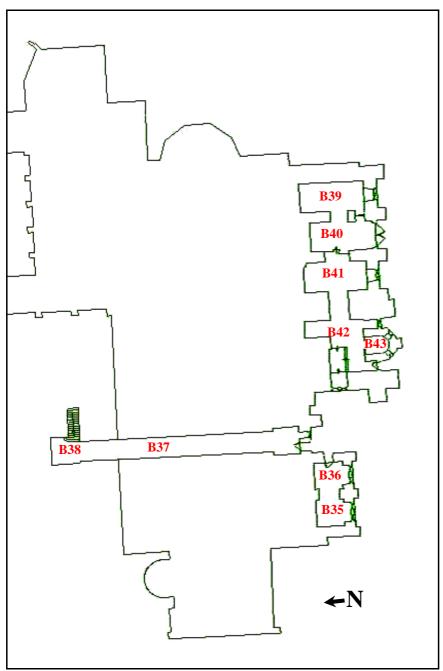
South range and Abbey church – basement plan Based on a drawing by LDN Architects with permission. Not to scale.
